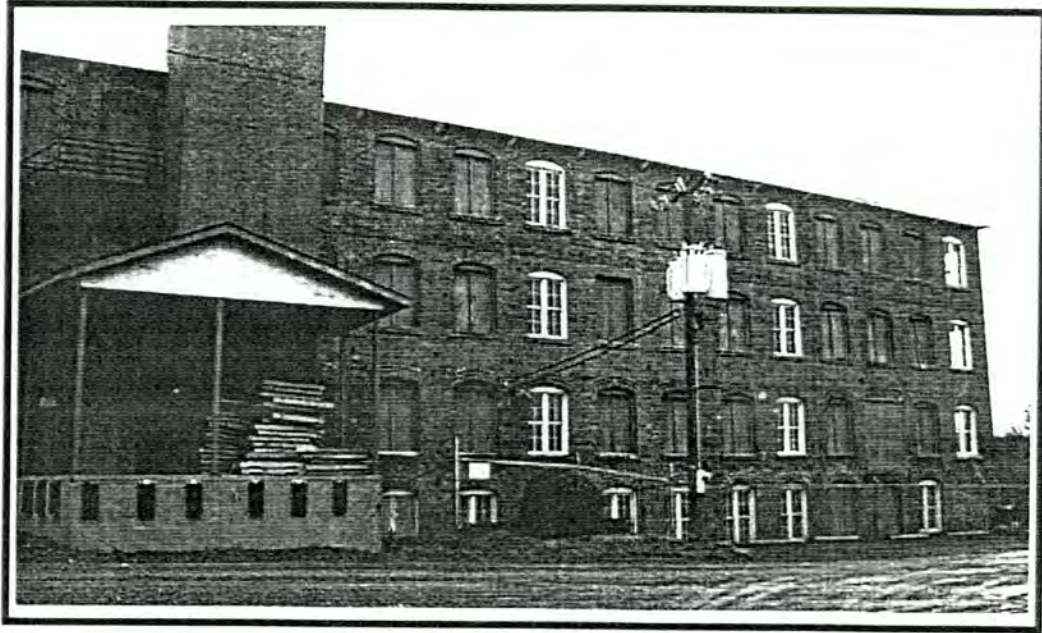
Southern elevation of the Piedmont Buggy Factory
